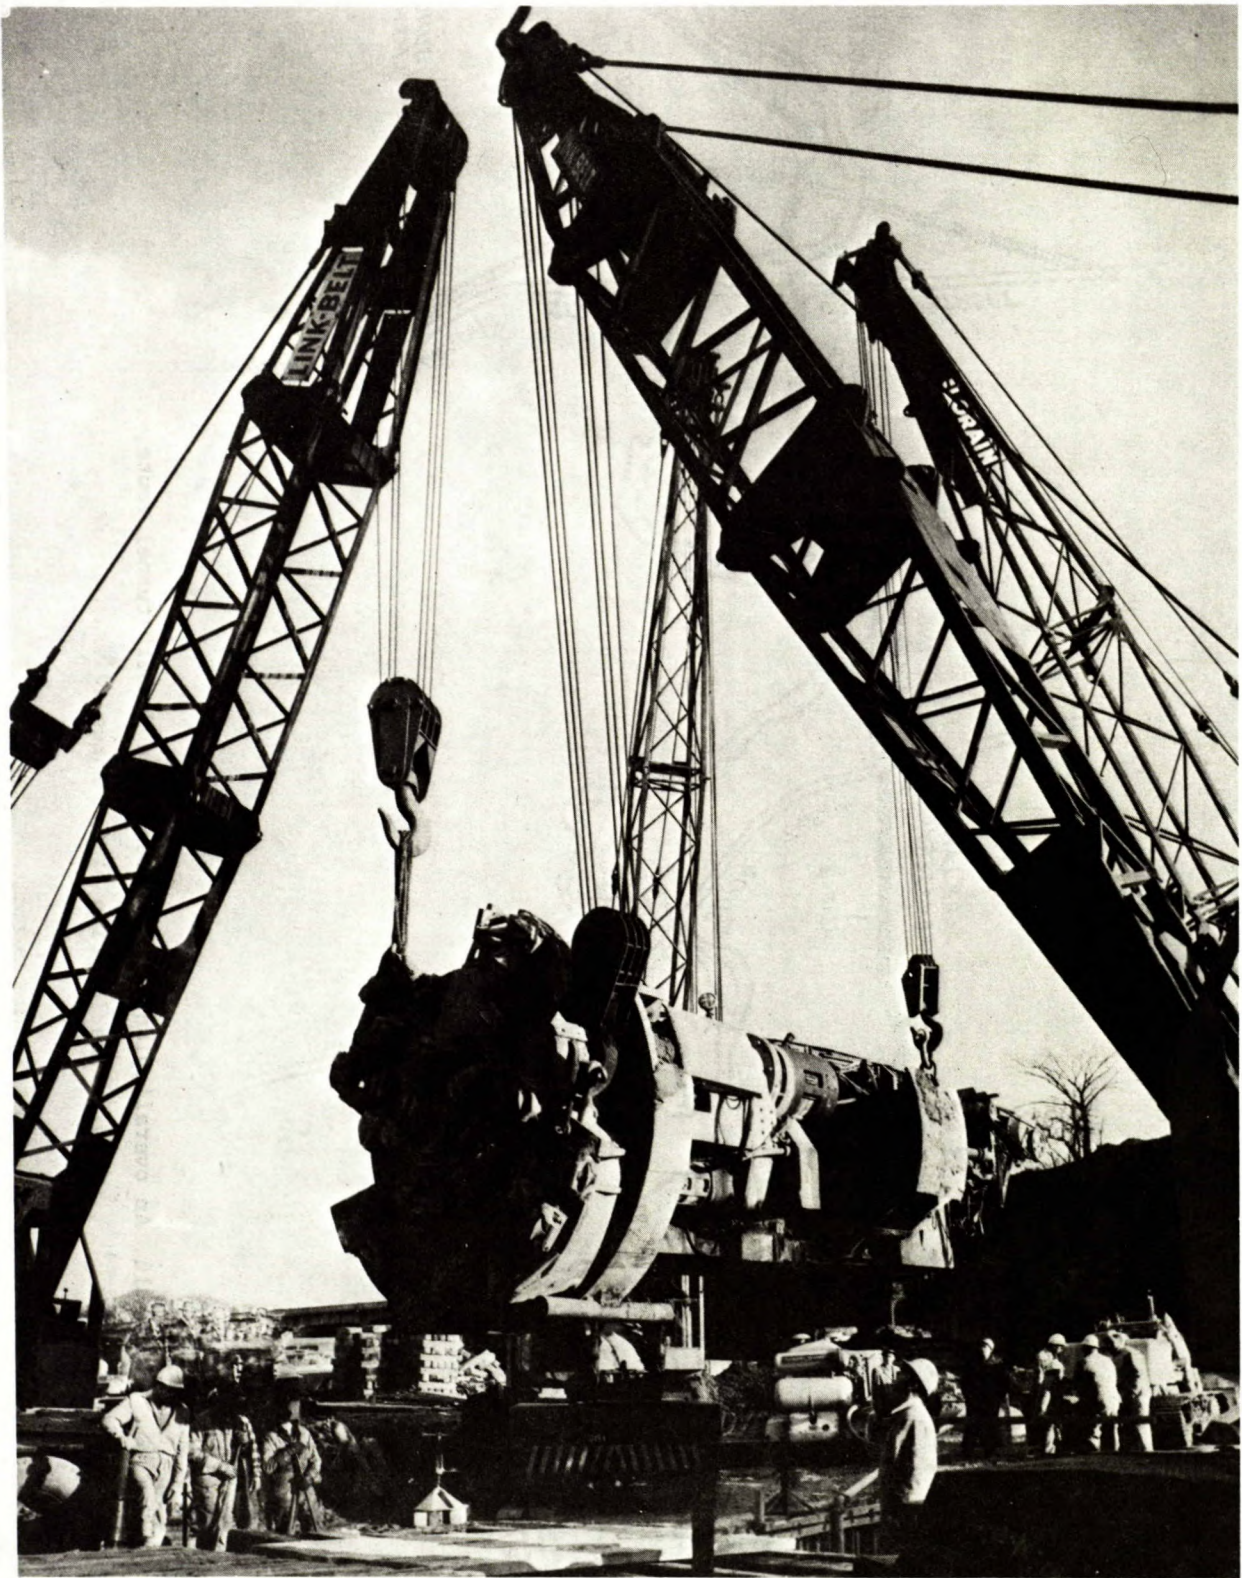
The Robbins boring machine, Model 131, being removed through shaft after completion of tunnel excavation on November 26, 1959.
